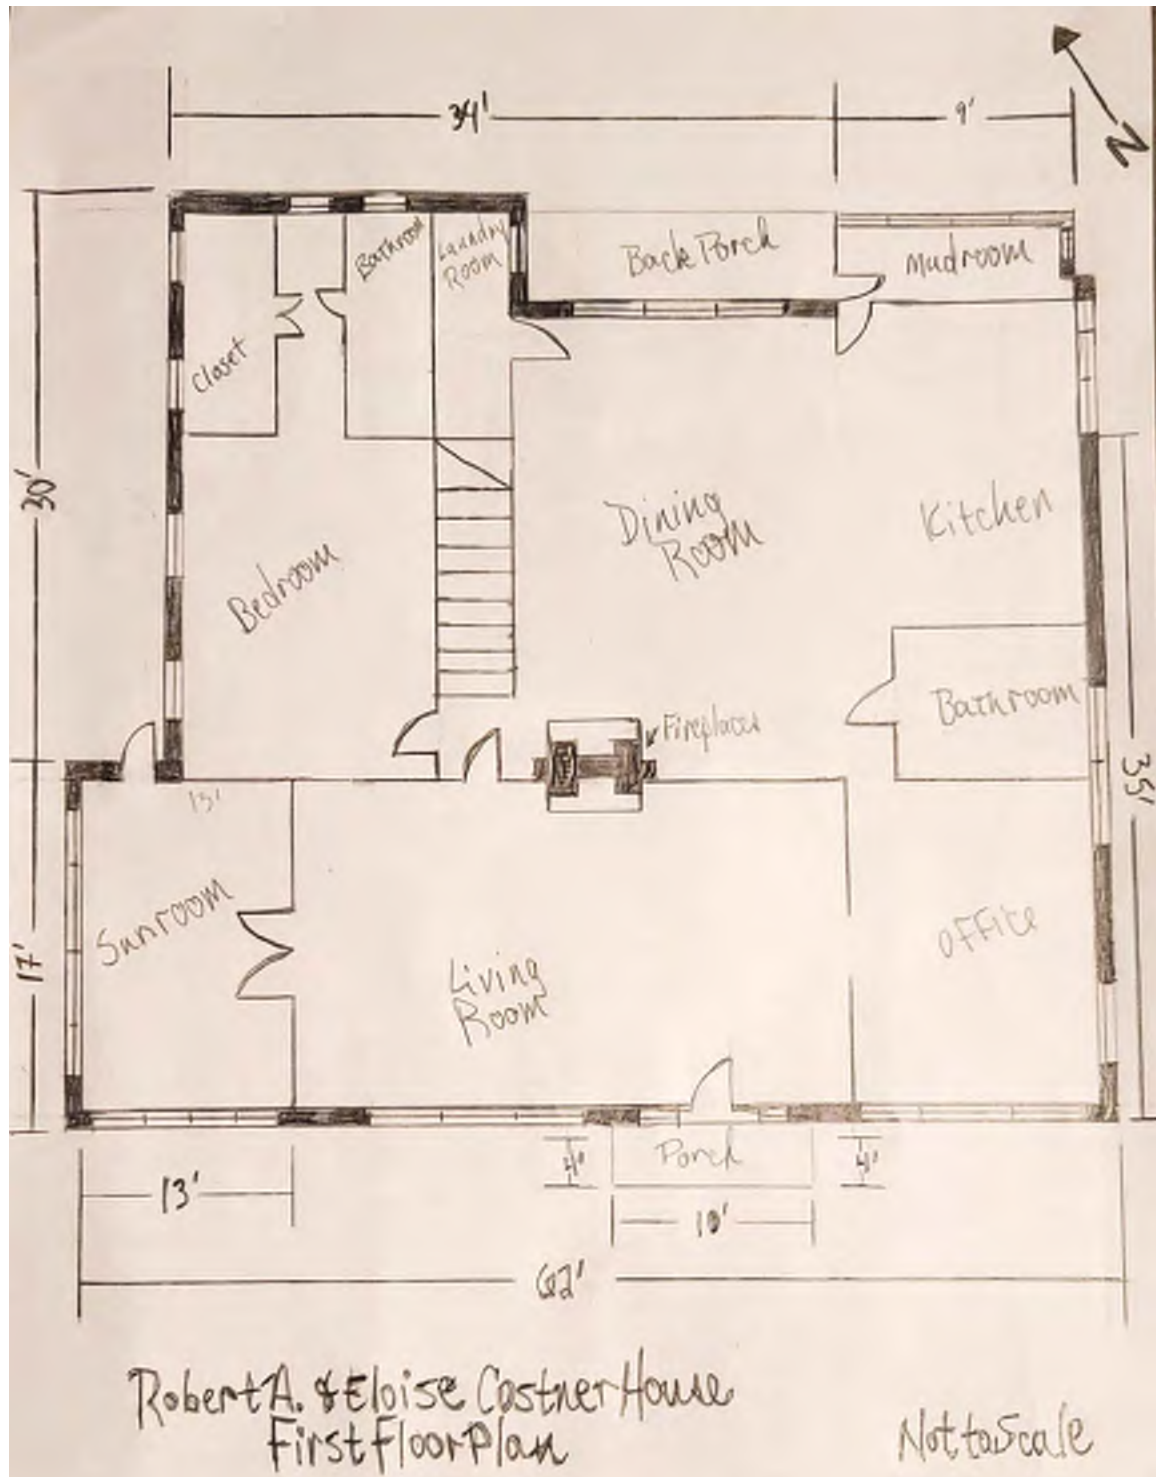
First Floor Plan, Robert A. and Eloise Costner House
